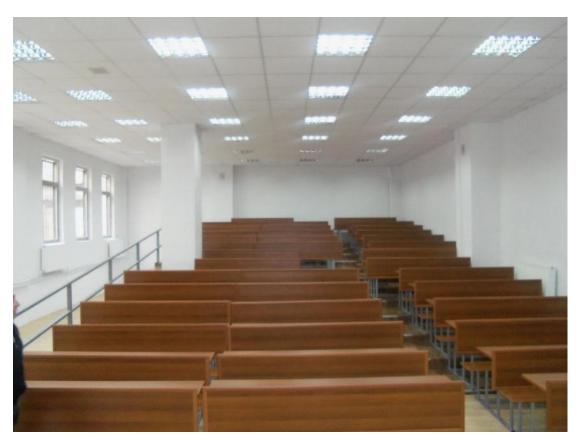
Refurbished lecture theatre at University Street site, Suspended ceiling grid, painted walls and polyvinyl flooring along with new furnishings, windows not replaced.
